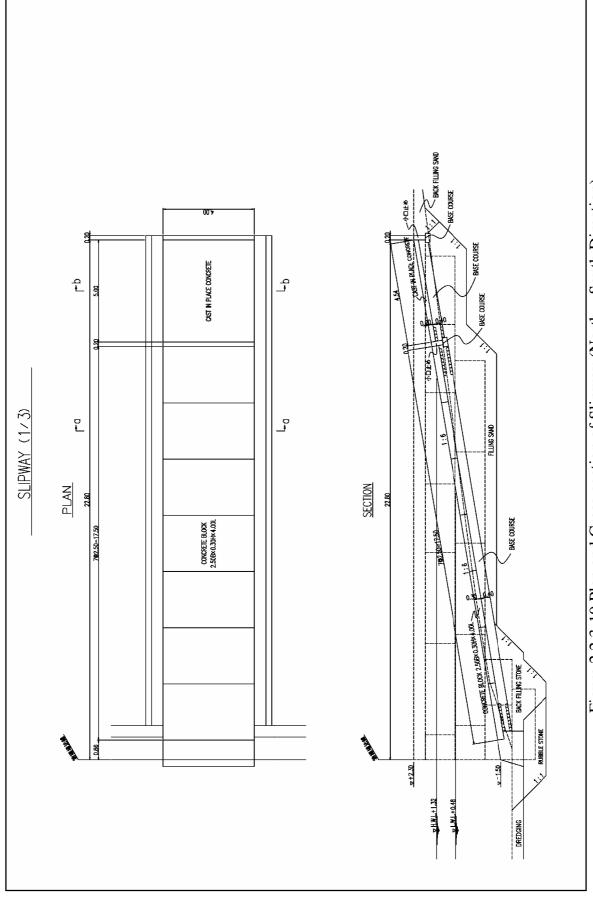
Plan and Cross-section of Slipway (North – South Direction)
